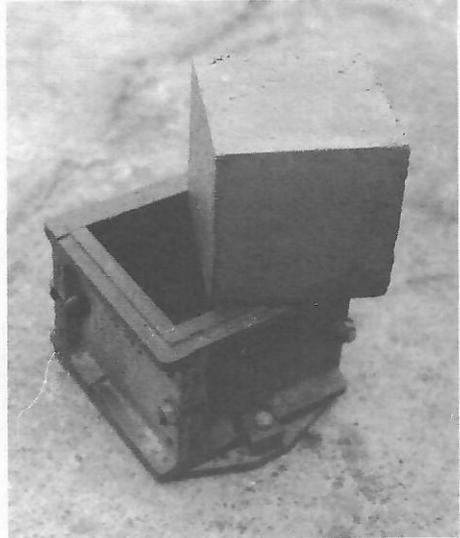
Typical concrete test cube with fabricated steel mould.
